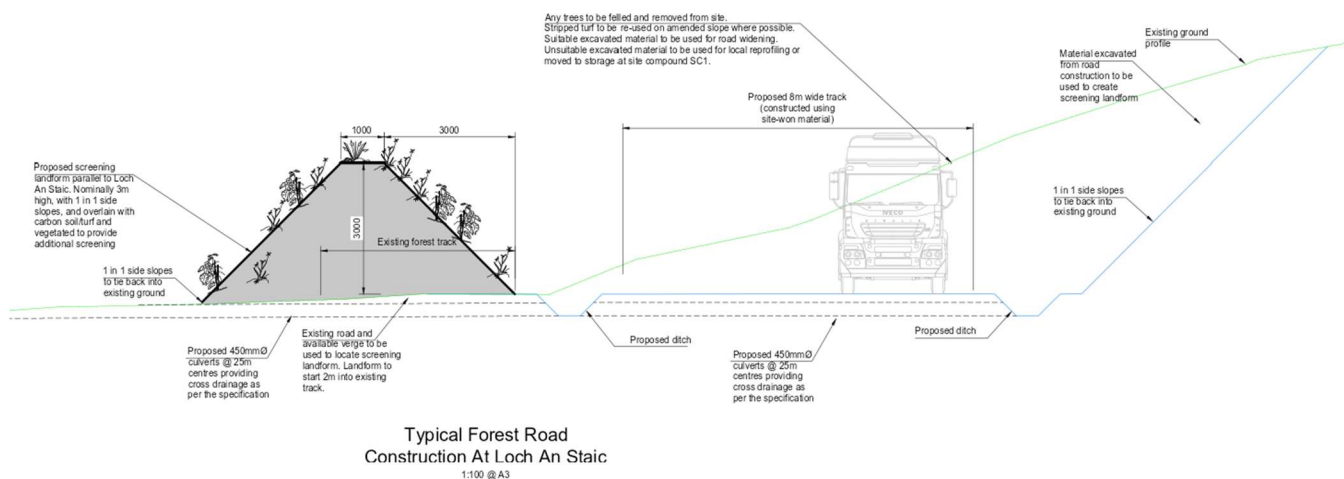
Section through SAR Screening Bund at Loch an Staic
